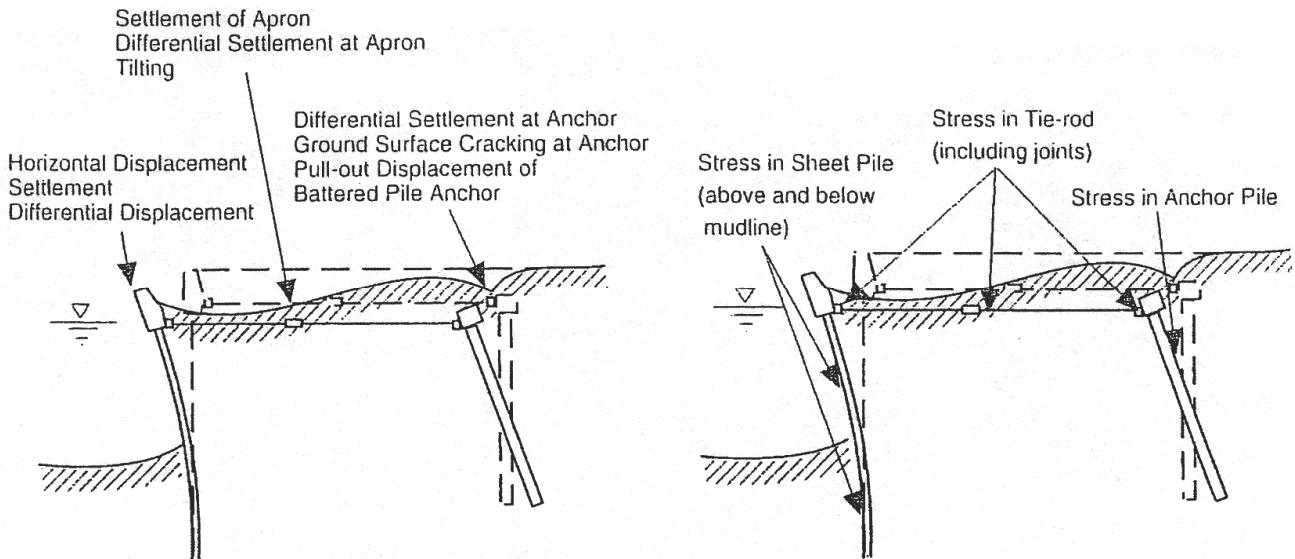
Schematic cross sections illustrating earthquake damage modes (left) and damage criteria (right) for sheet pile walls with tieback anchors (PIANC, 2002).
